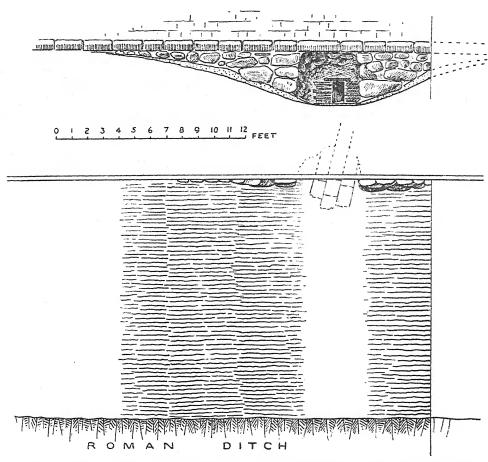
Culvert under wall and ditch, W. of All Hallows Church. From Archæologia, LX.
